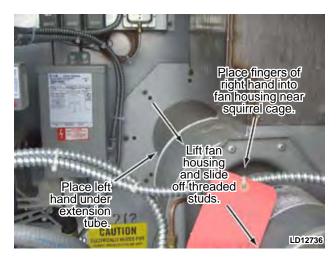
REMOVE ID FAN HOUSING FROM HEAT EXCHANGER
